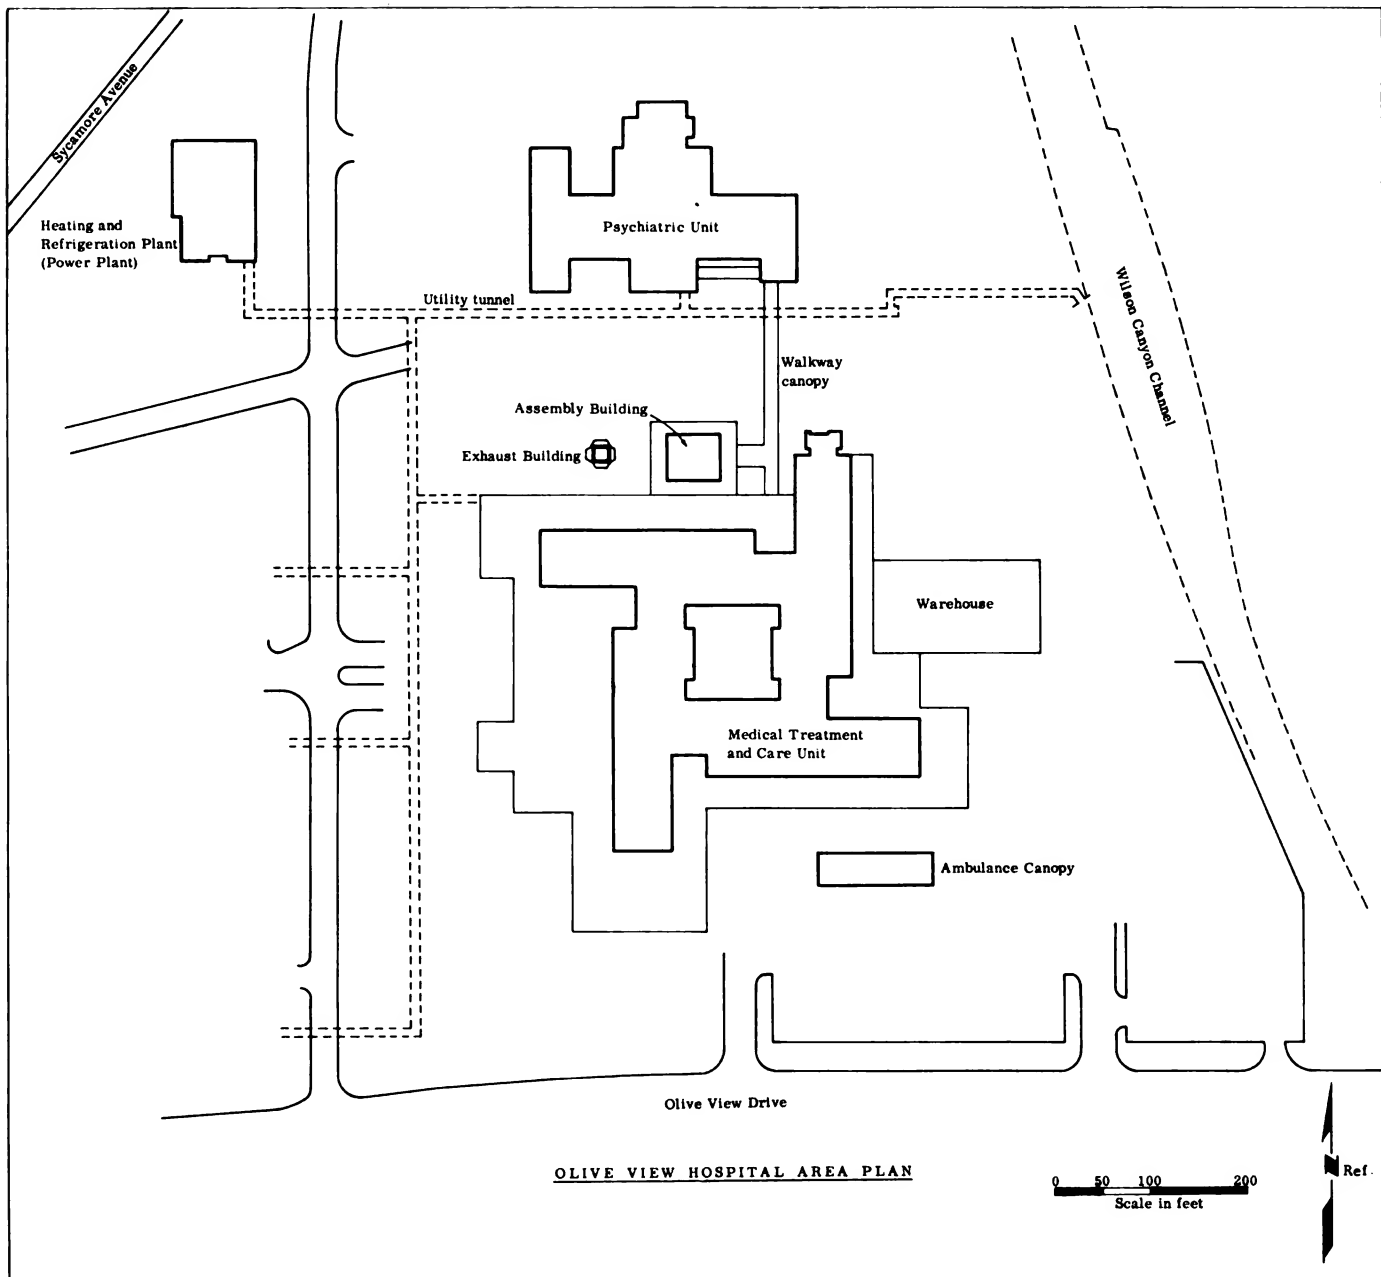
Olive View Hospital. Newer buildings. Area plan of site, showing medical treatment and care unit, psychiatric unit, and heating and refrigeration plant.
